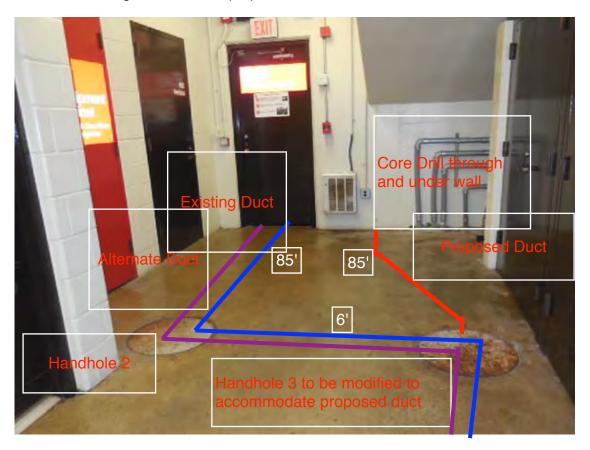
Existing, alternate and proposed ducts in back room corridor.
